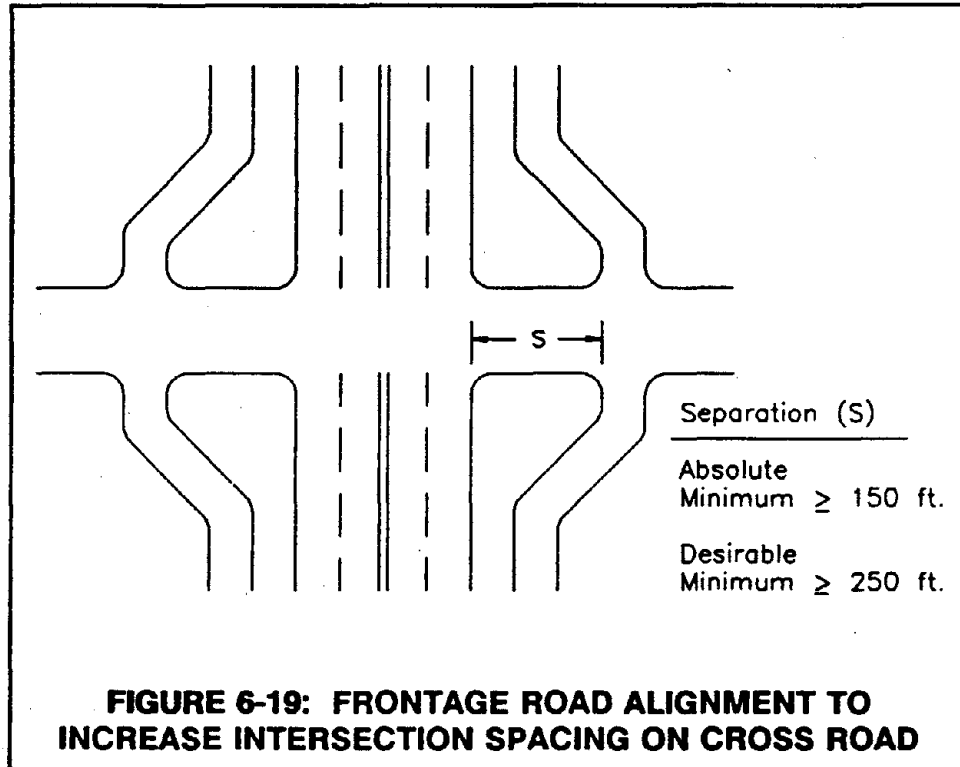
FRONTAGE ROAD ALIGNMENT TO INCREASE INTERSECTION SPACING ON CROSS ROAD
